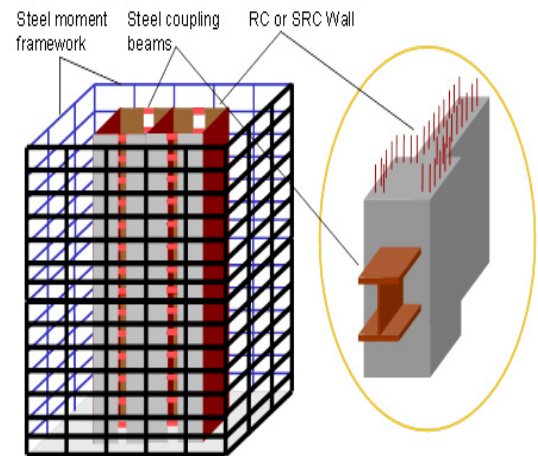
Composite steel and concrete structures cause problems (Sterchelegroup Building Systems)
